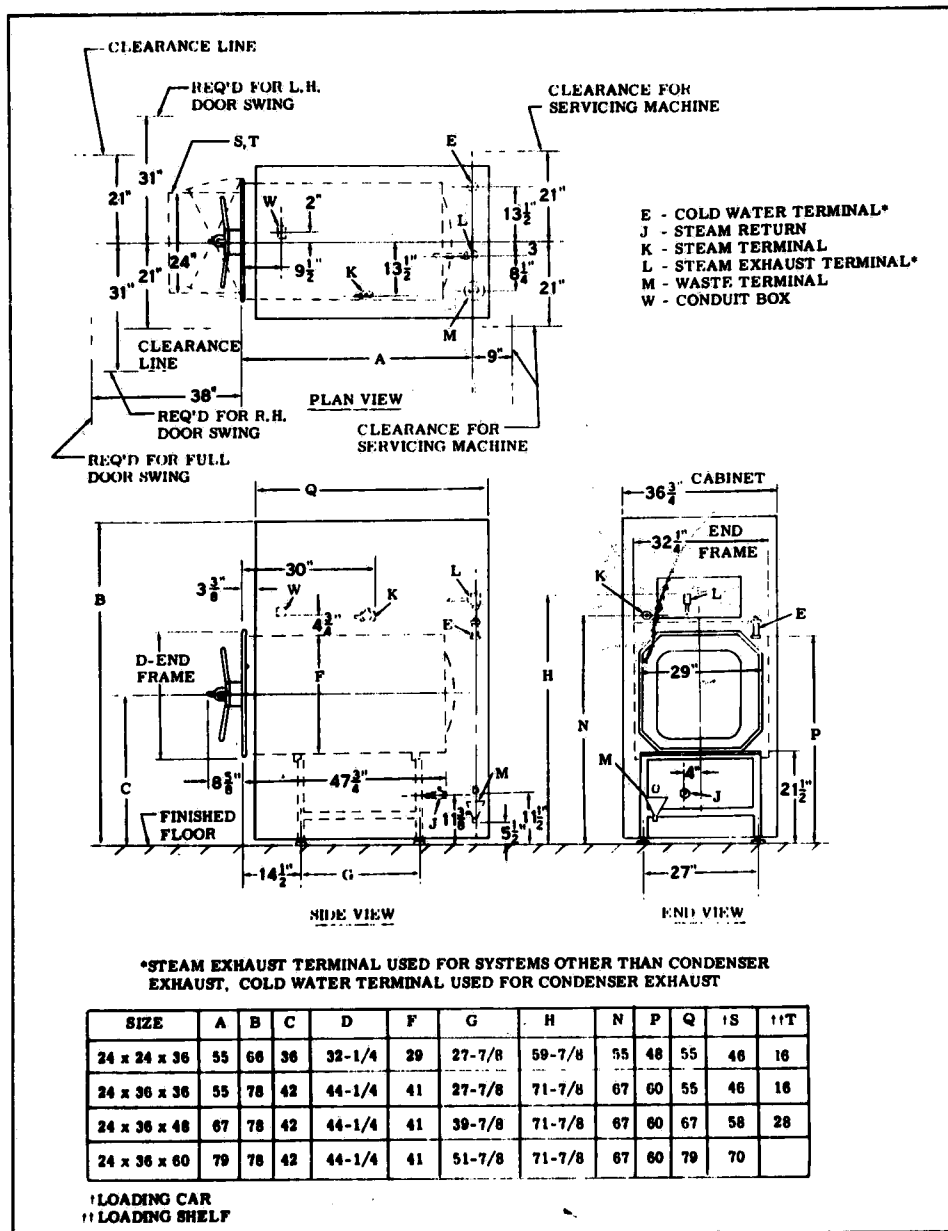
Installation Plan for Cabinet Mounted Single Door Sterilizers
